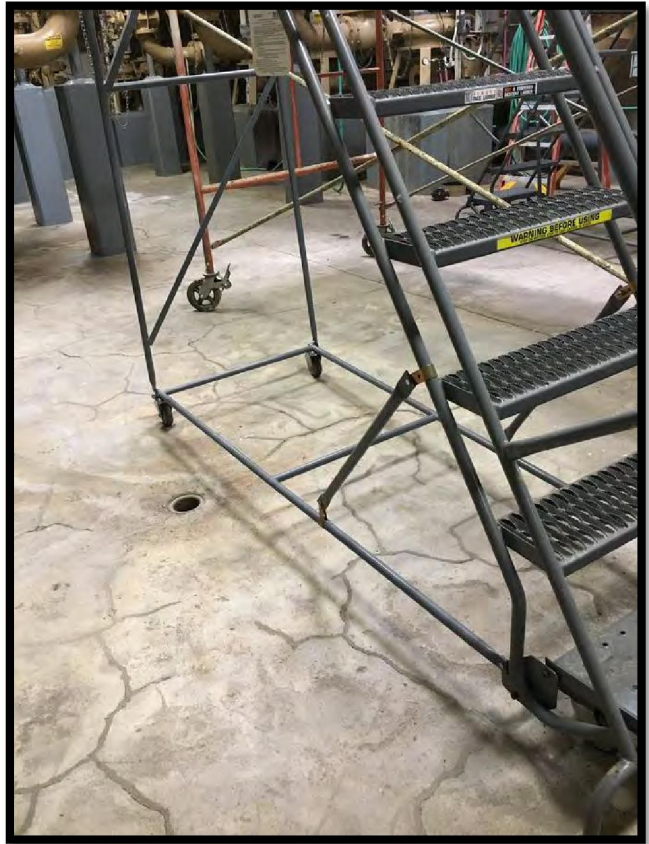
A&B, Aerobic Basin Basement Floor and Wall
